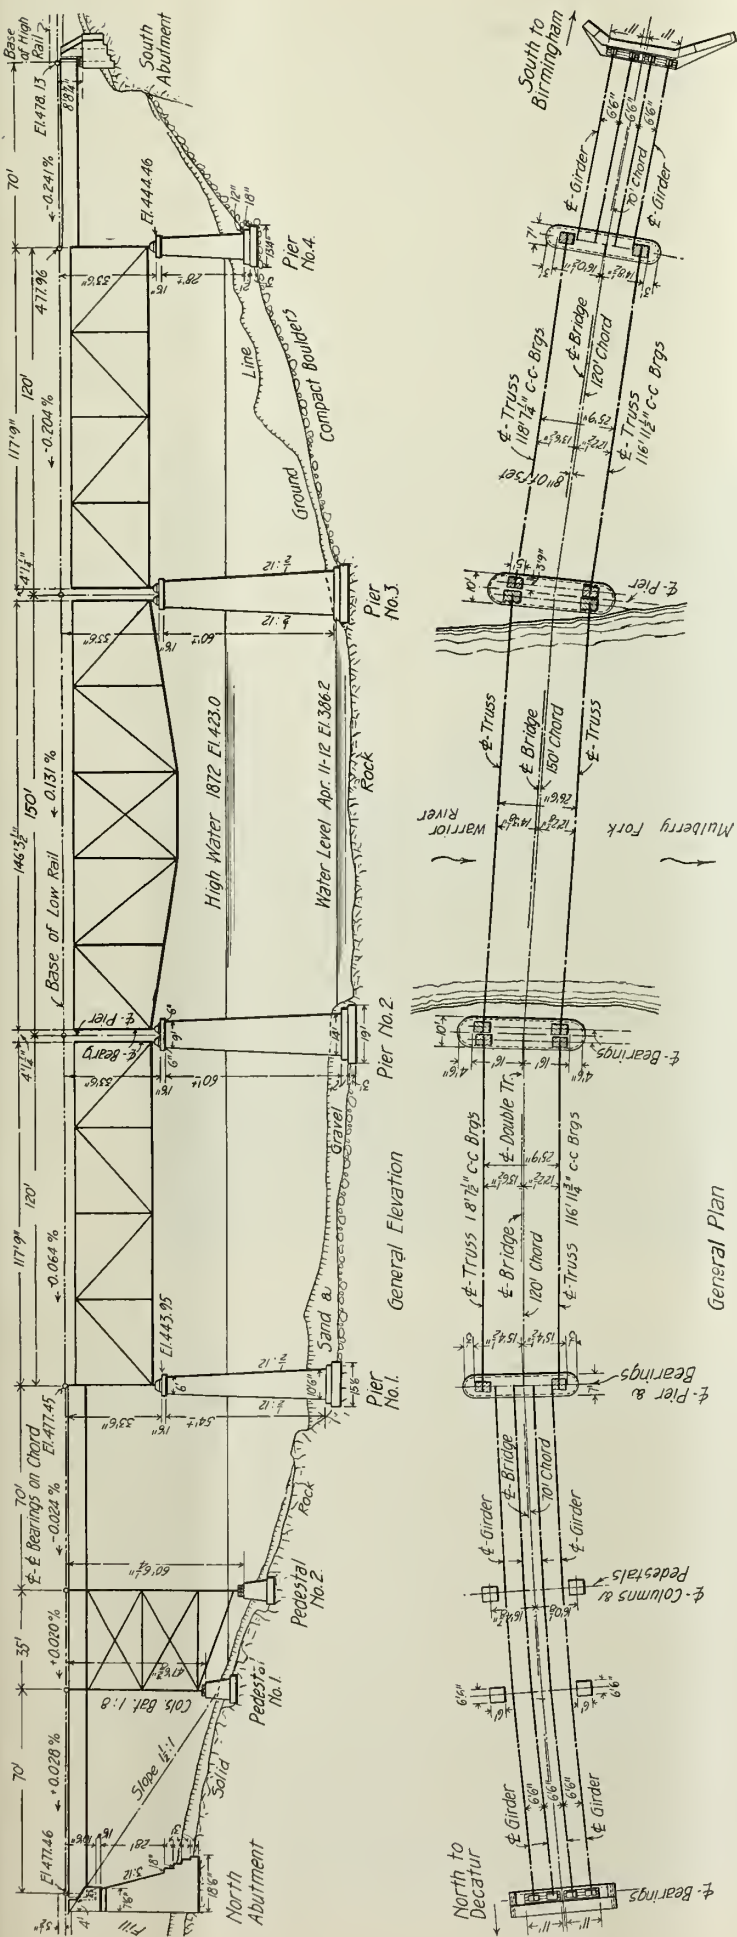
General Plan and Elevation of Bridge at Mulberry Fork of Warrior River, Louisville & Nashville R. R.
